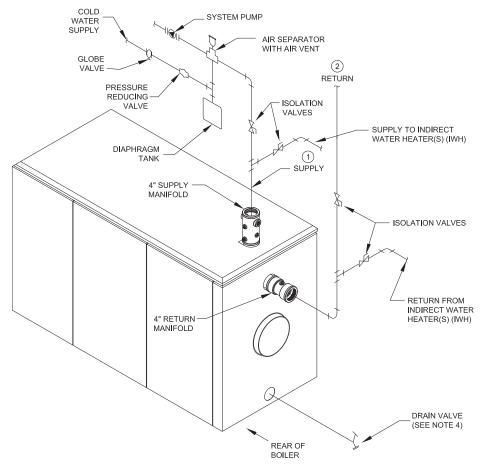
Recommended MPC Minimum Piping - Single Boiler Application
